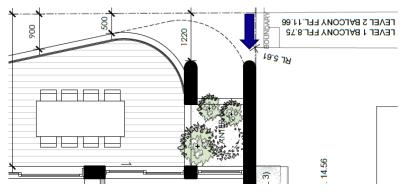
Extent of proposed wall on boundary to retain the neighbour's north westerly peripheral view
